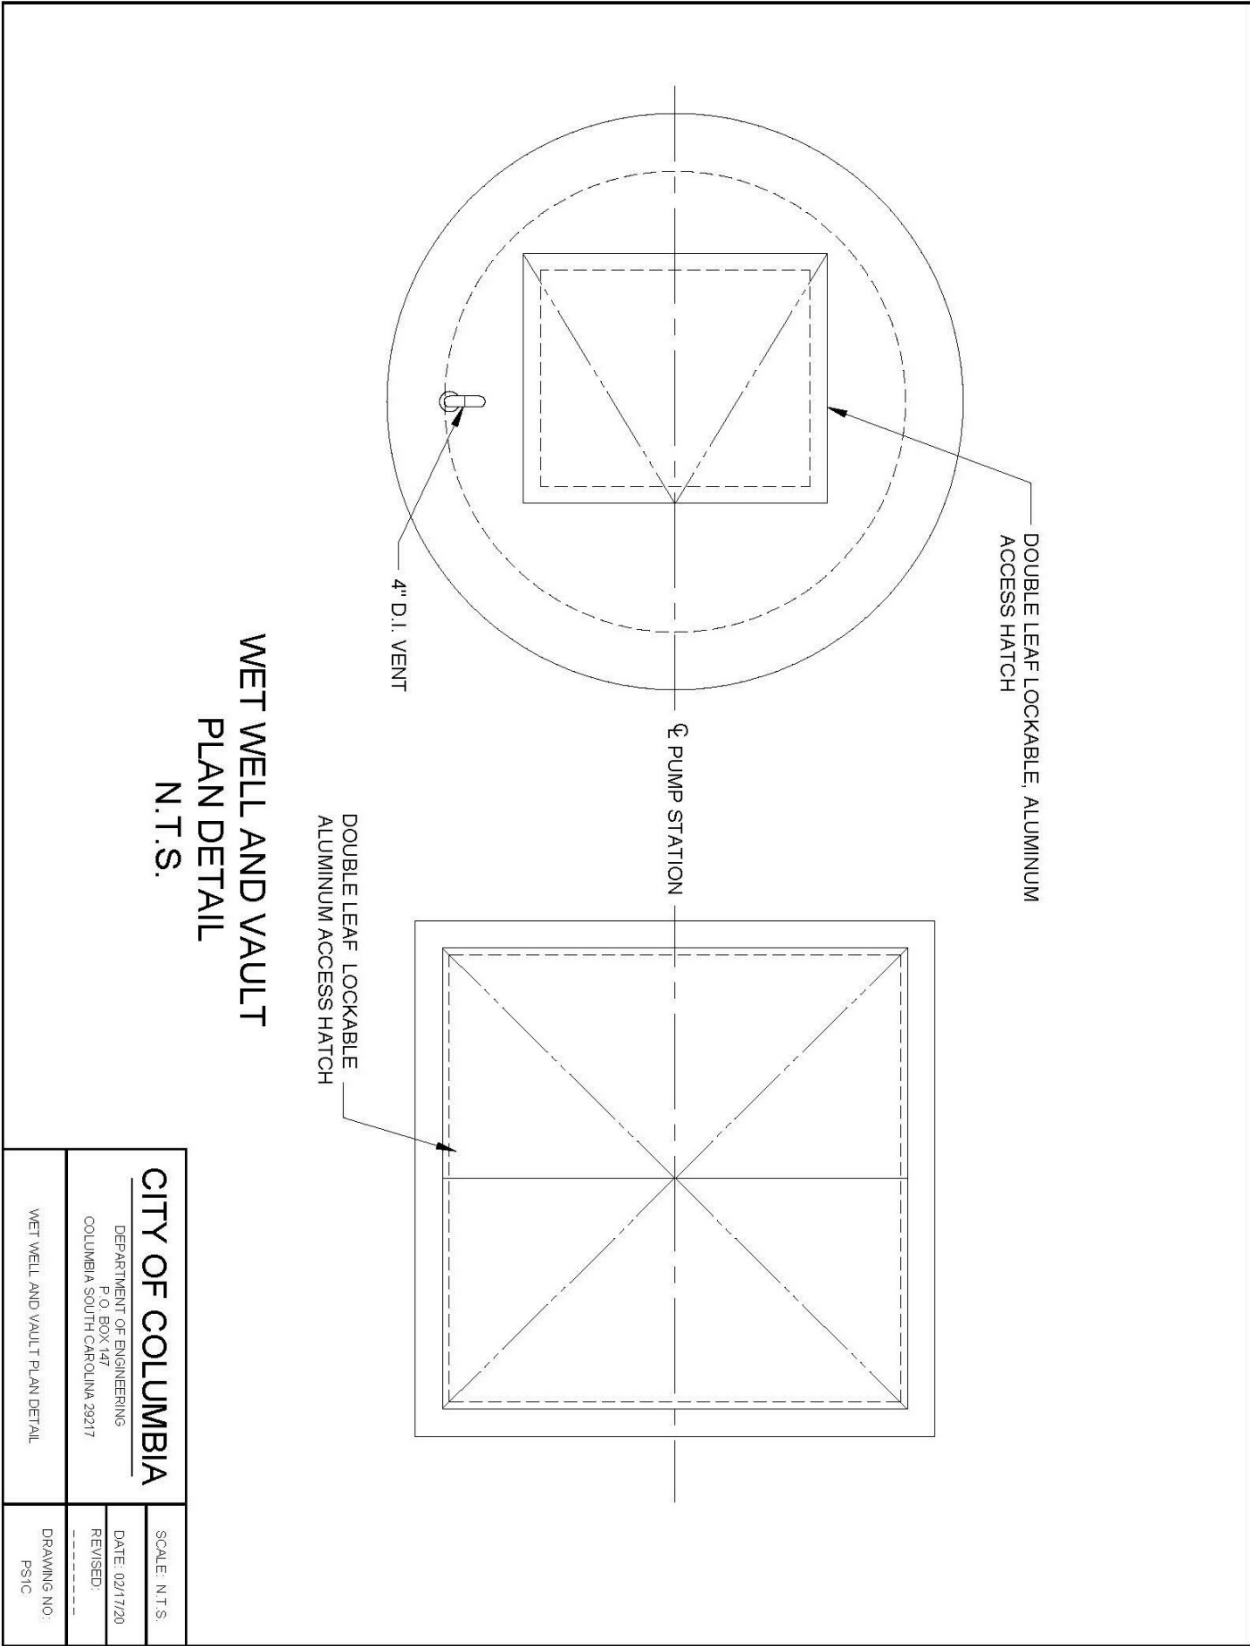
PS1C - Wet Well and Vault Plan Detail (2)
